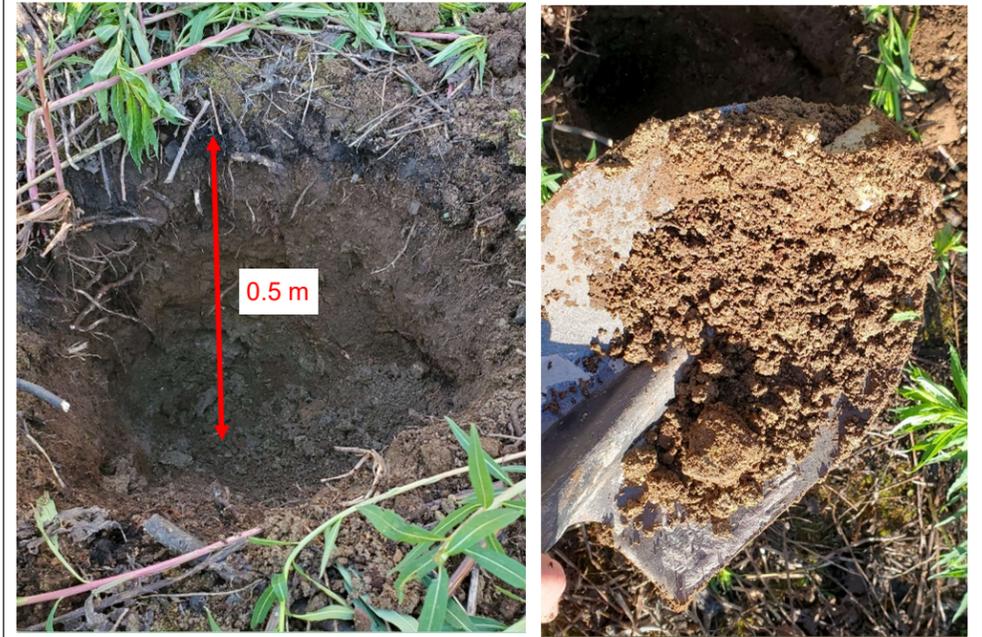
Shall probe hole dug at the Bertha Mid-Mountain station site.
